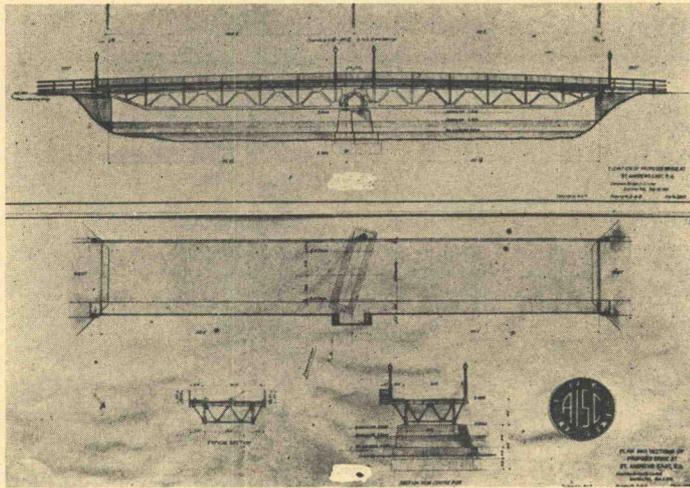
Proposed Continuous Deck Bridge at St. Andrews, Province of Quebec
